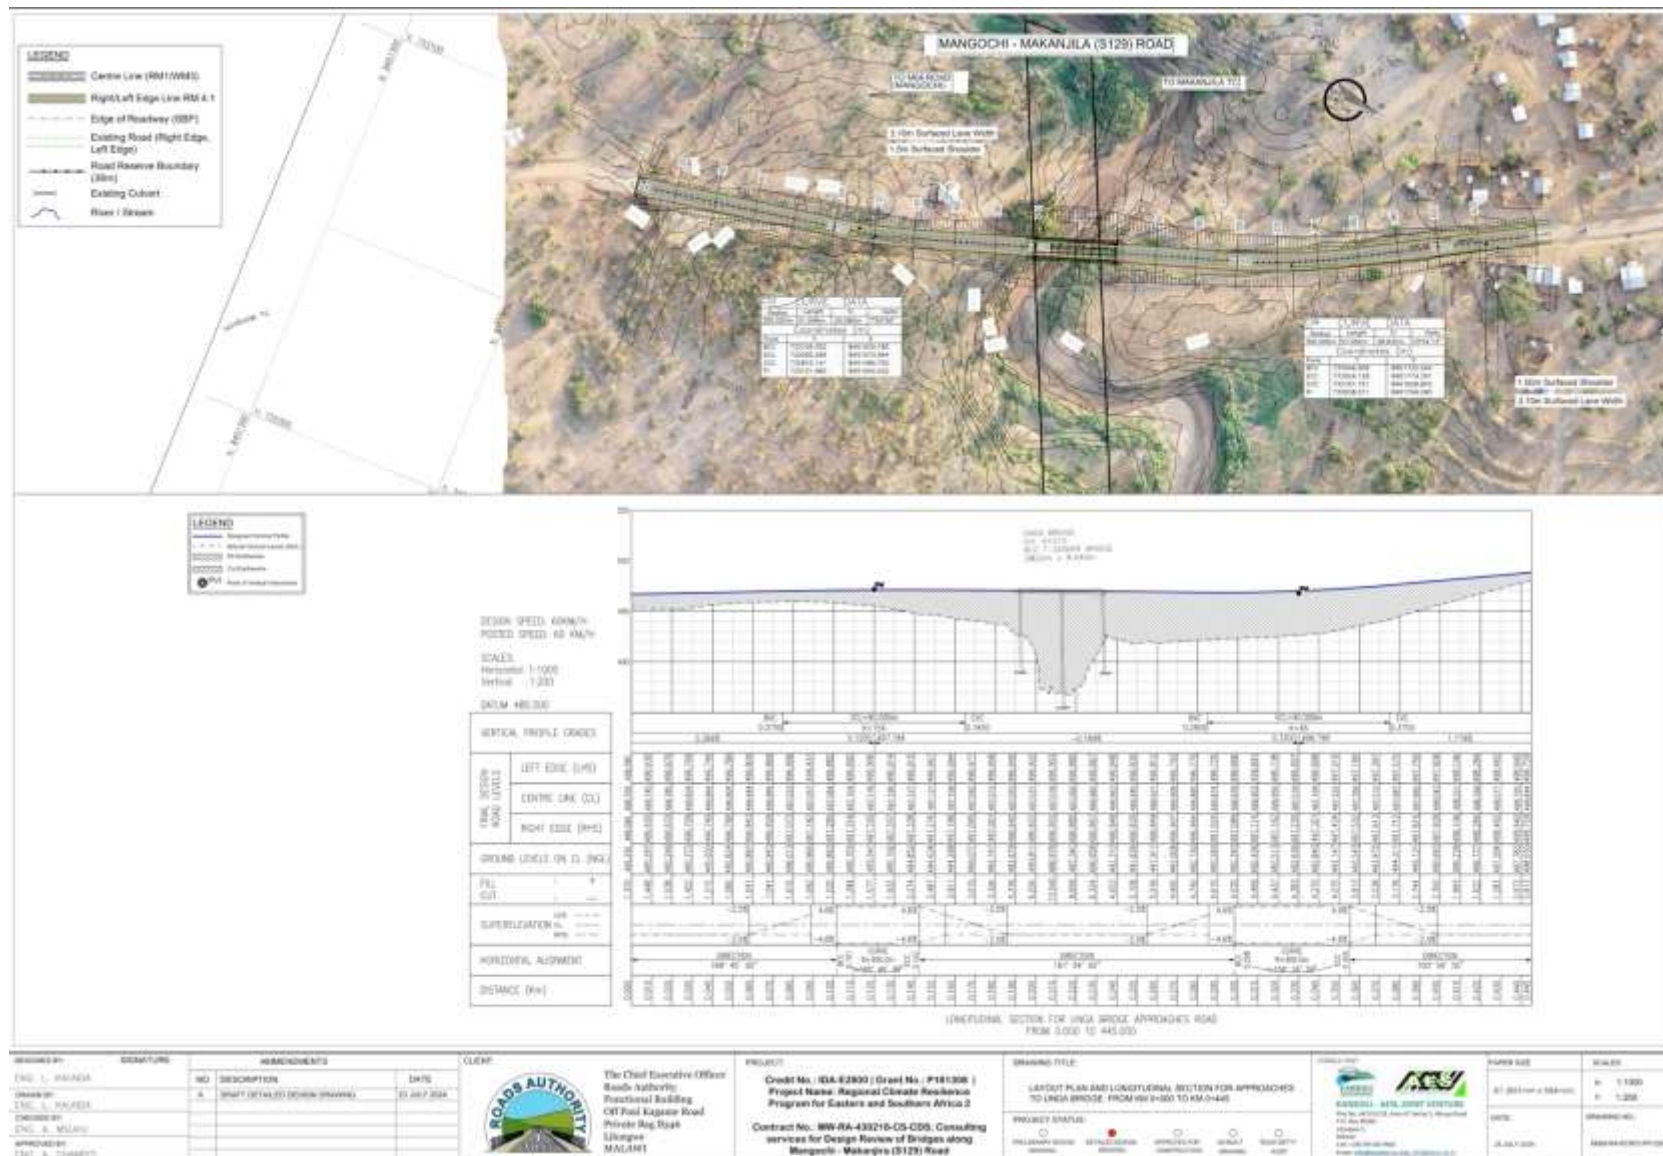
Unga Bridge Layout Plan and Longitudinal Section for Road Approaches
